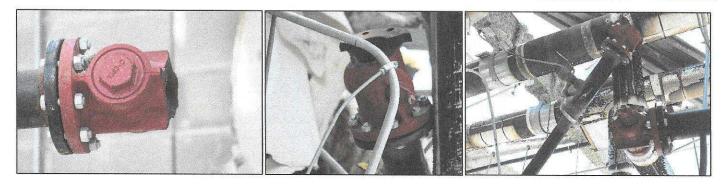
The fractured flanges shown in Figure 21 matched the fractured cast iron plug valve housings in the boiler room.
